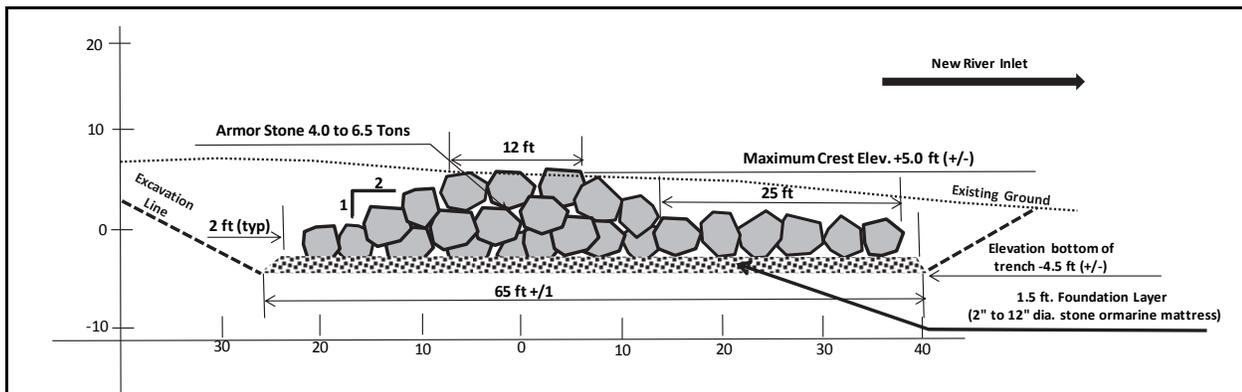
Typical terminal groin rubblemound schematic for Cross-Section B-B-centerline stations 3+50 to 11+50.
